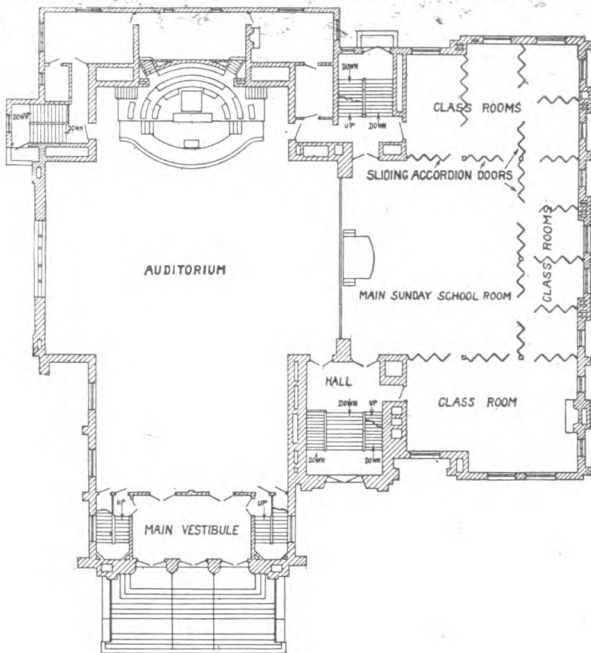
PLAN OF A LARGE SUNDAY SCHOOL ROOM
